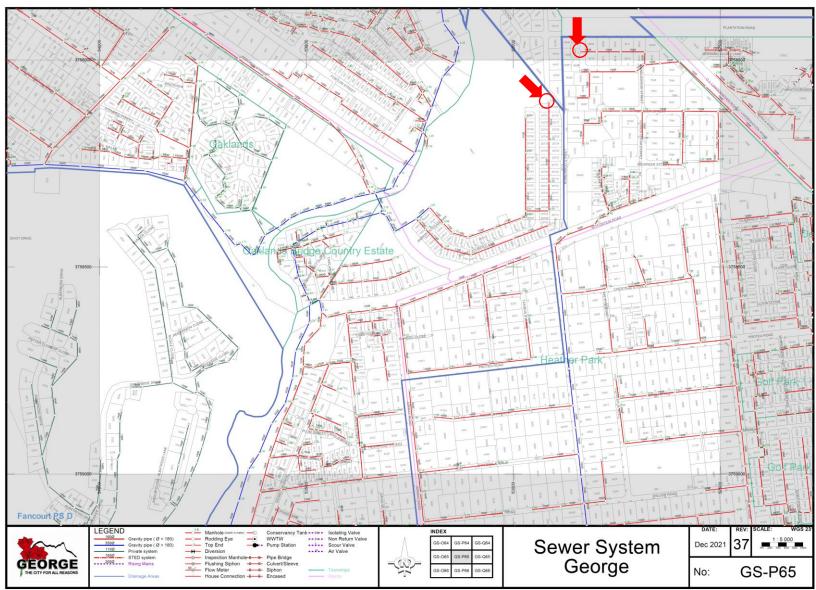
Proposed Sewer Connection Points – as pointed out by GLS Consulting Engineers.
